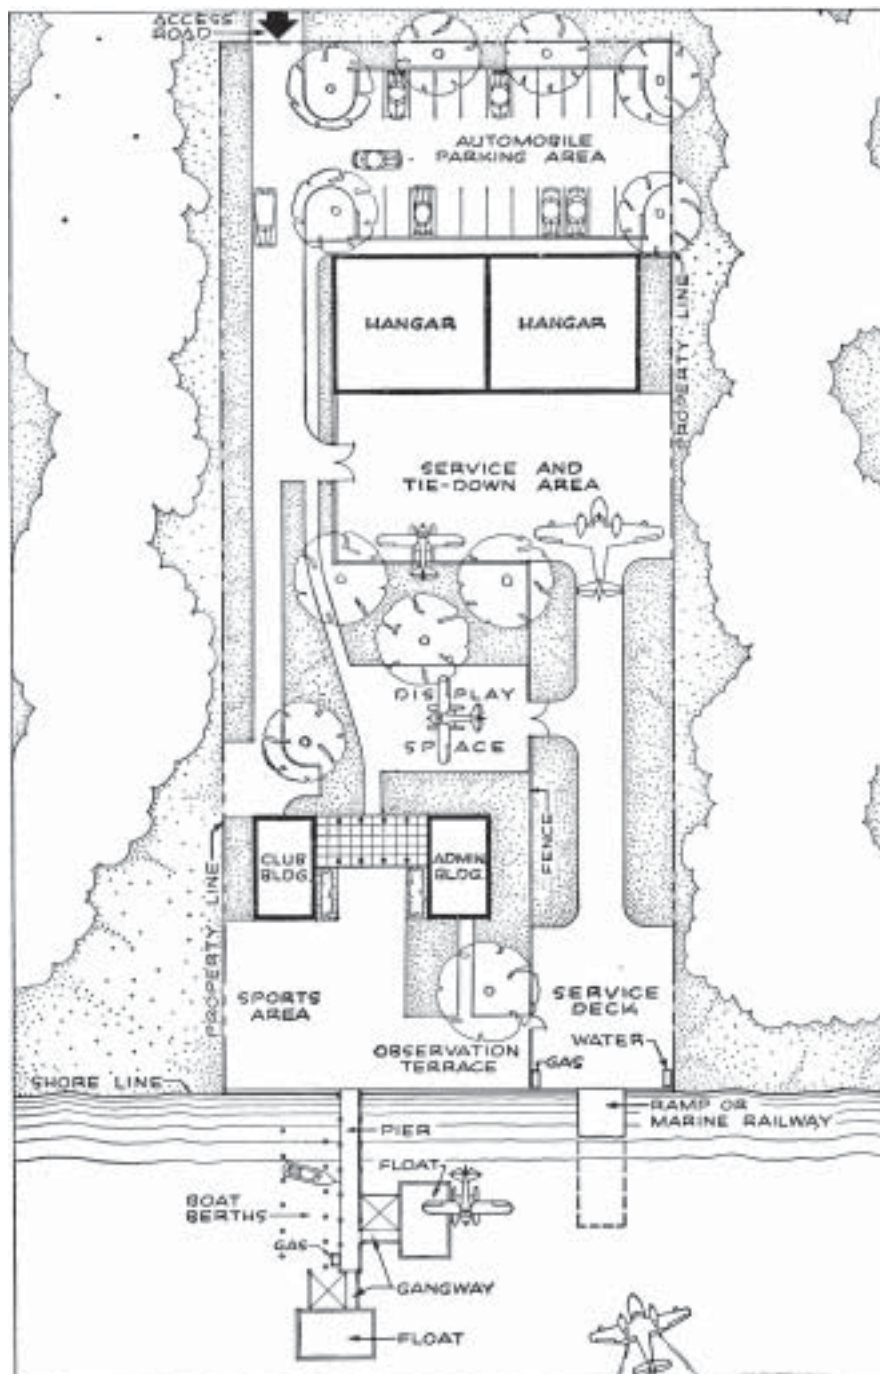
Typical Layout of On-Shore and Shore-Line Development
